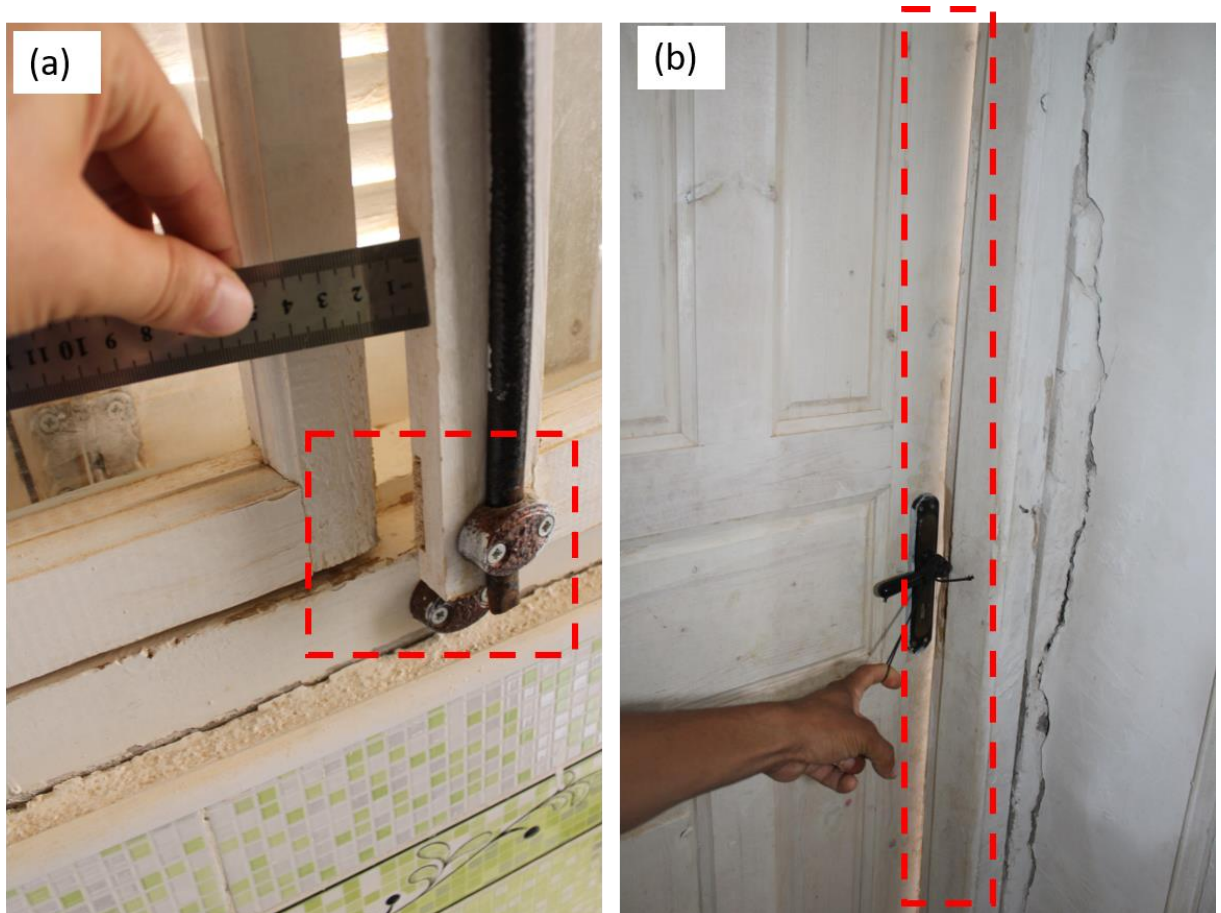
(a) Sticking of window at building 8 of Area 1; (b) Sticking of door at building 4 of Area 3.
